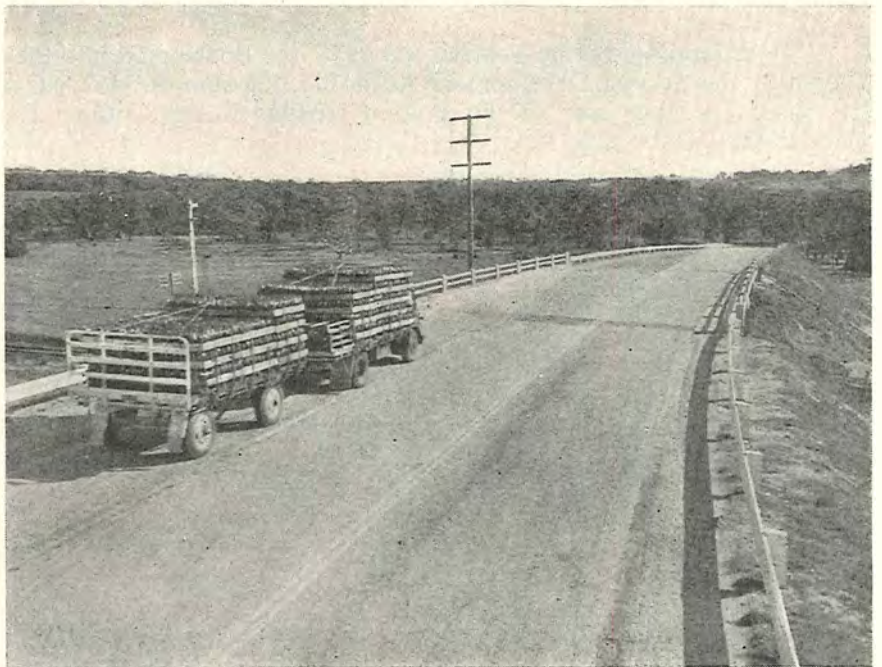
Road over Rail Overpass on the Western Highway at Beaufort.
